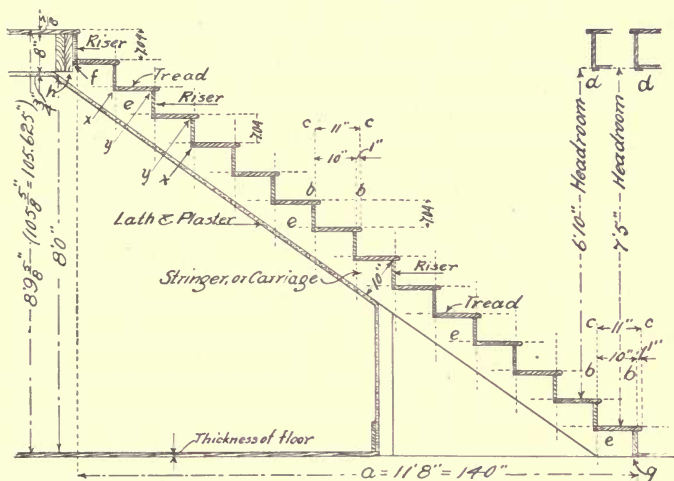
METHOD OF LAYING OUT A STAIRWAY.
